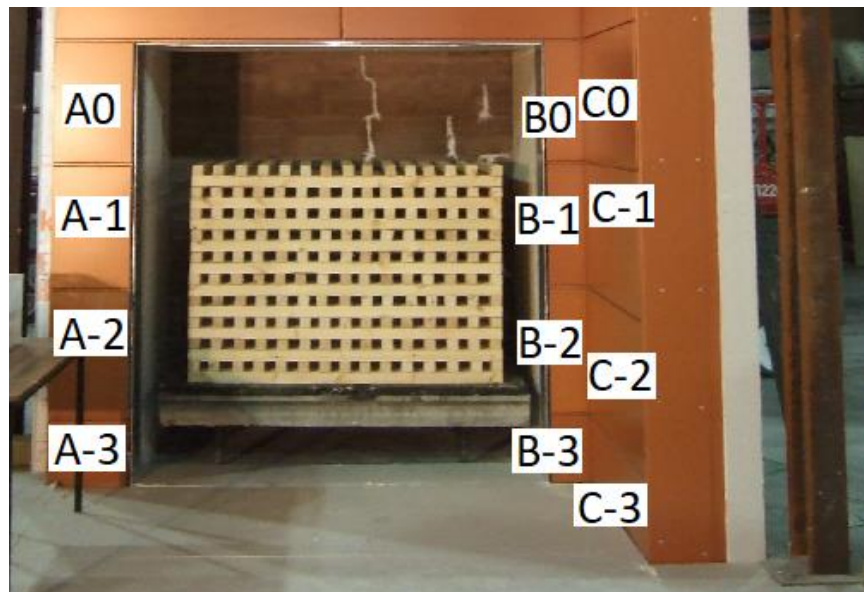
Cladding system facing parts identification for referencing (up to combustion chamber opening)
